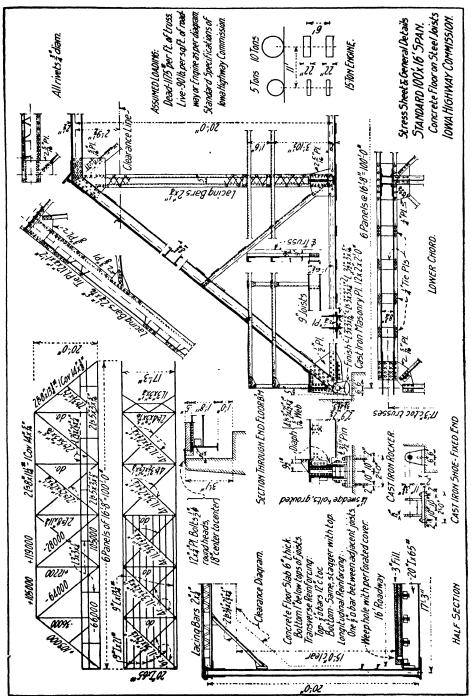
STANDARD HIGH THROUGH TRUSS SPAN.
